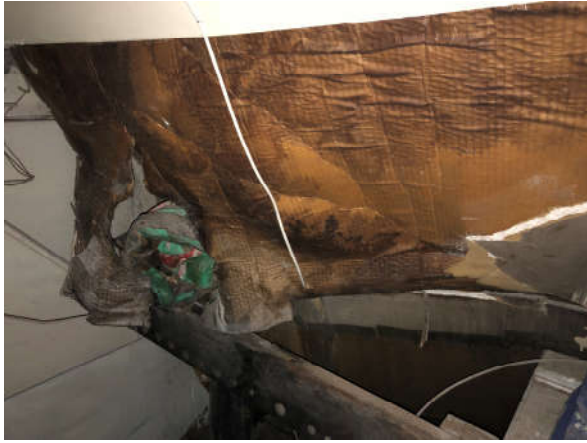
View of mold observed in loft of building #3 at 2824 North Nevada Street.
